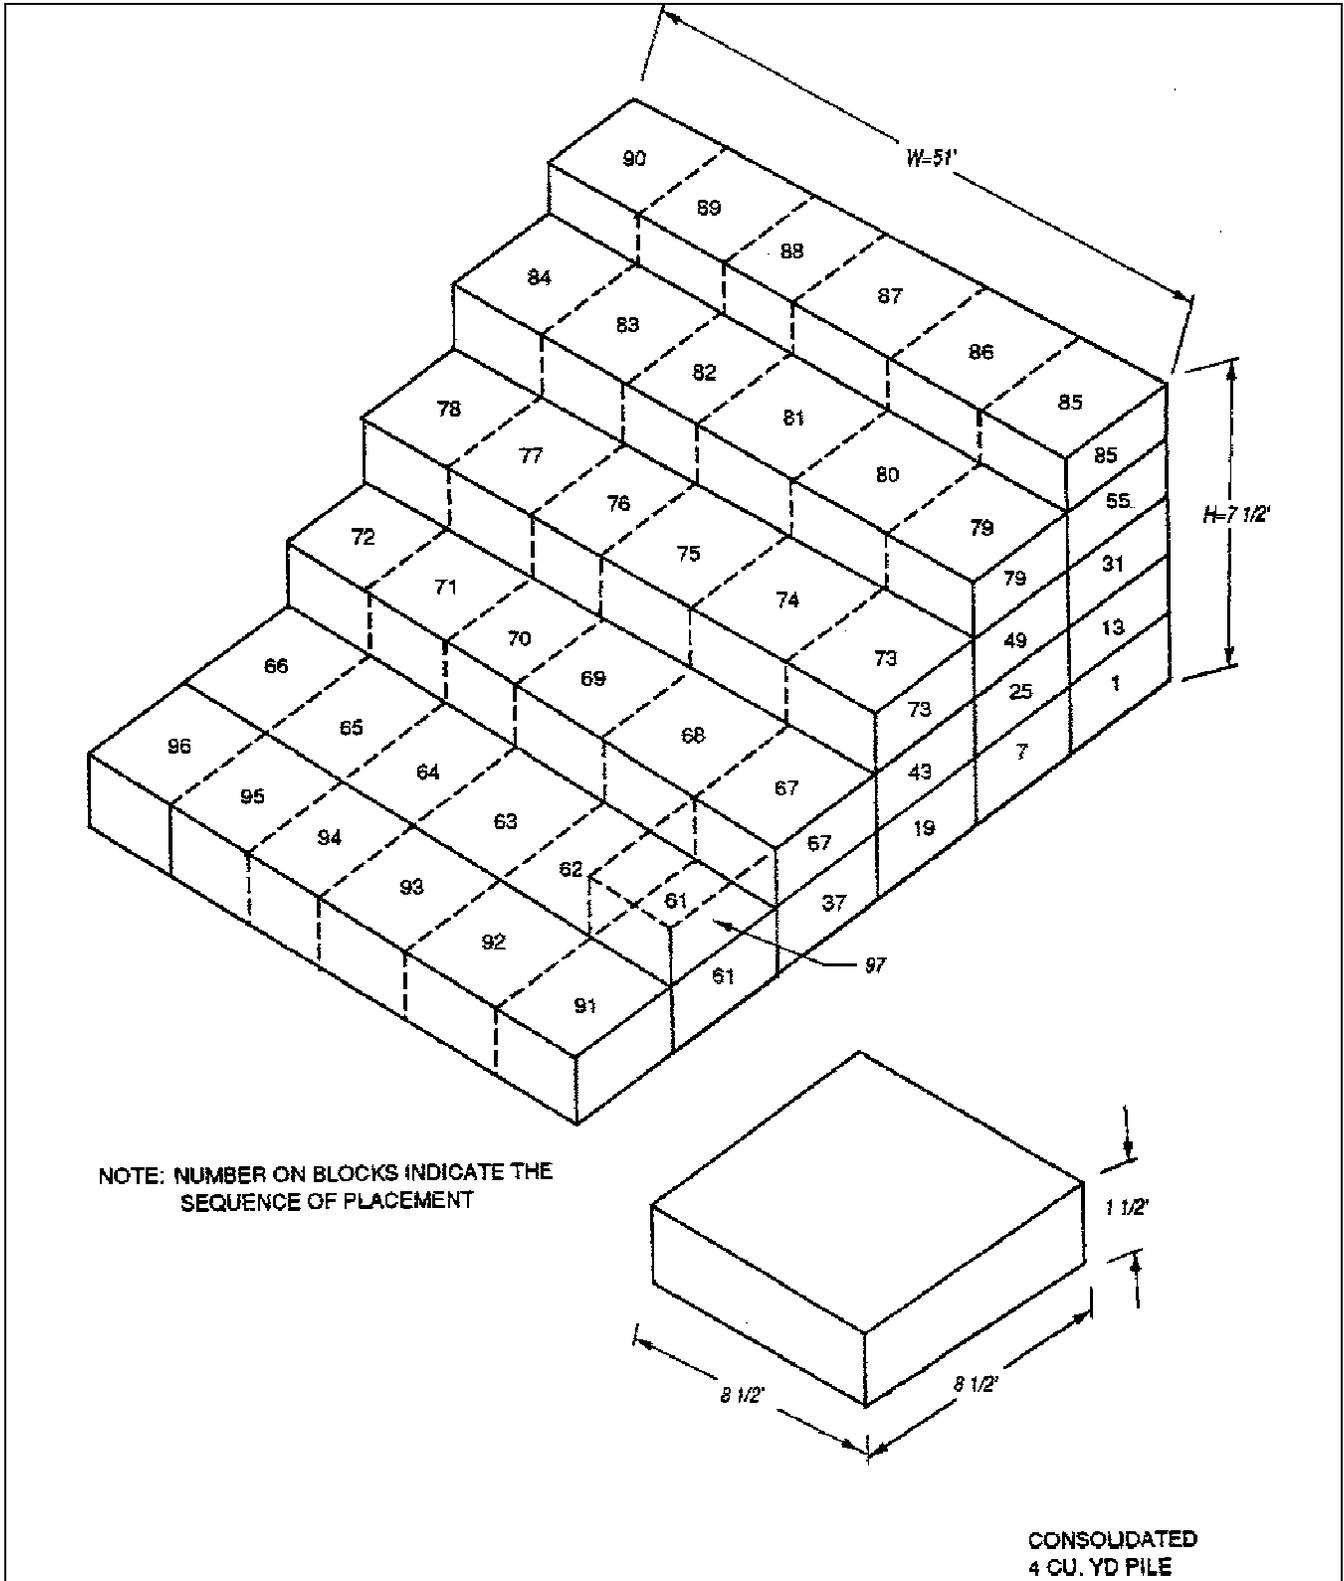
Stepped placement sequence and plant capacity, 7-1/2-ft lift height
